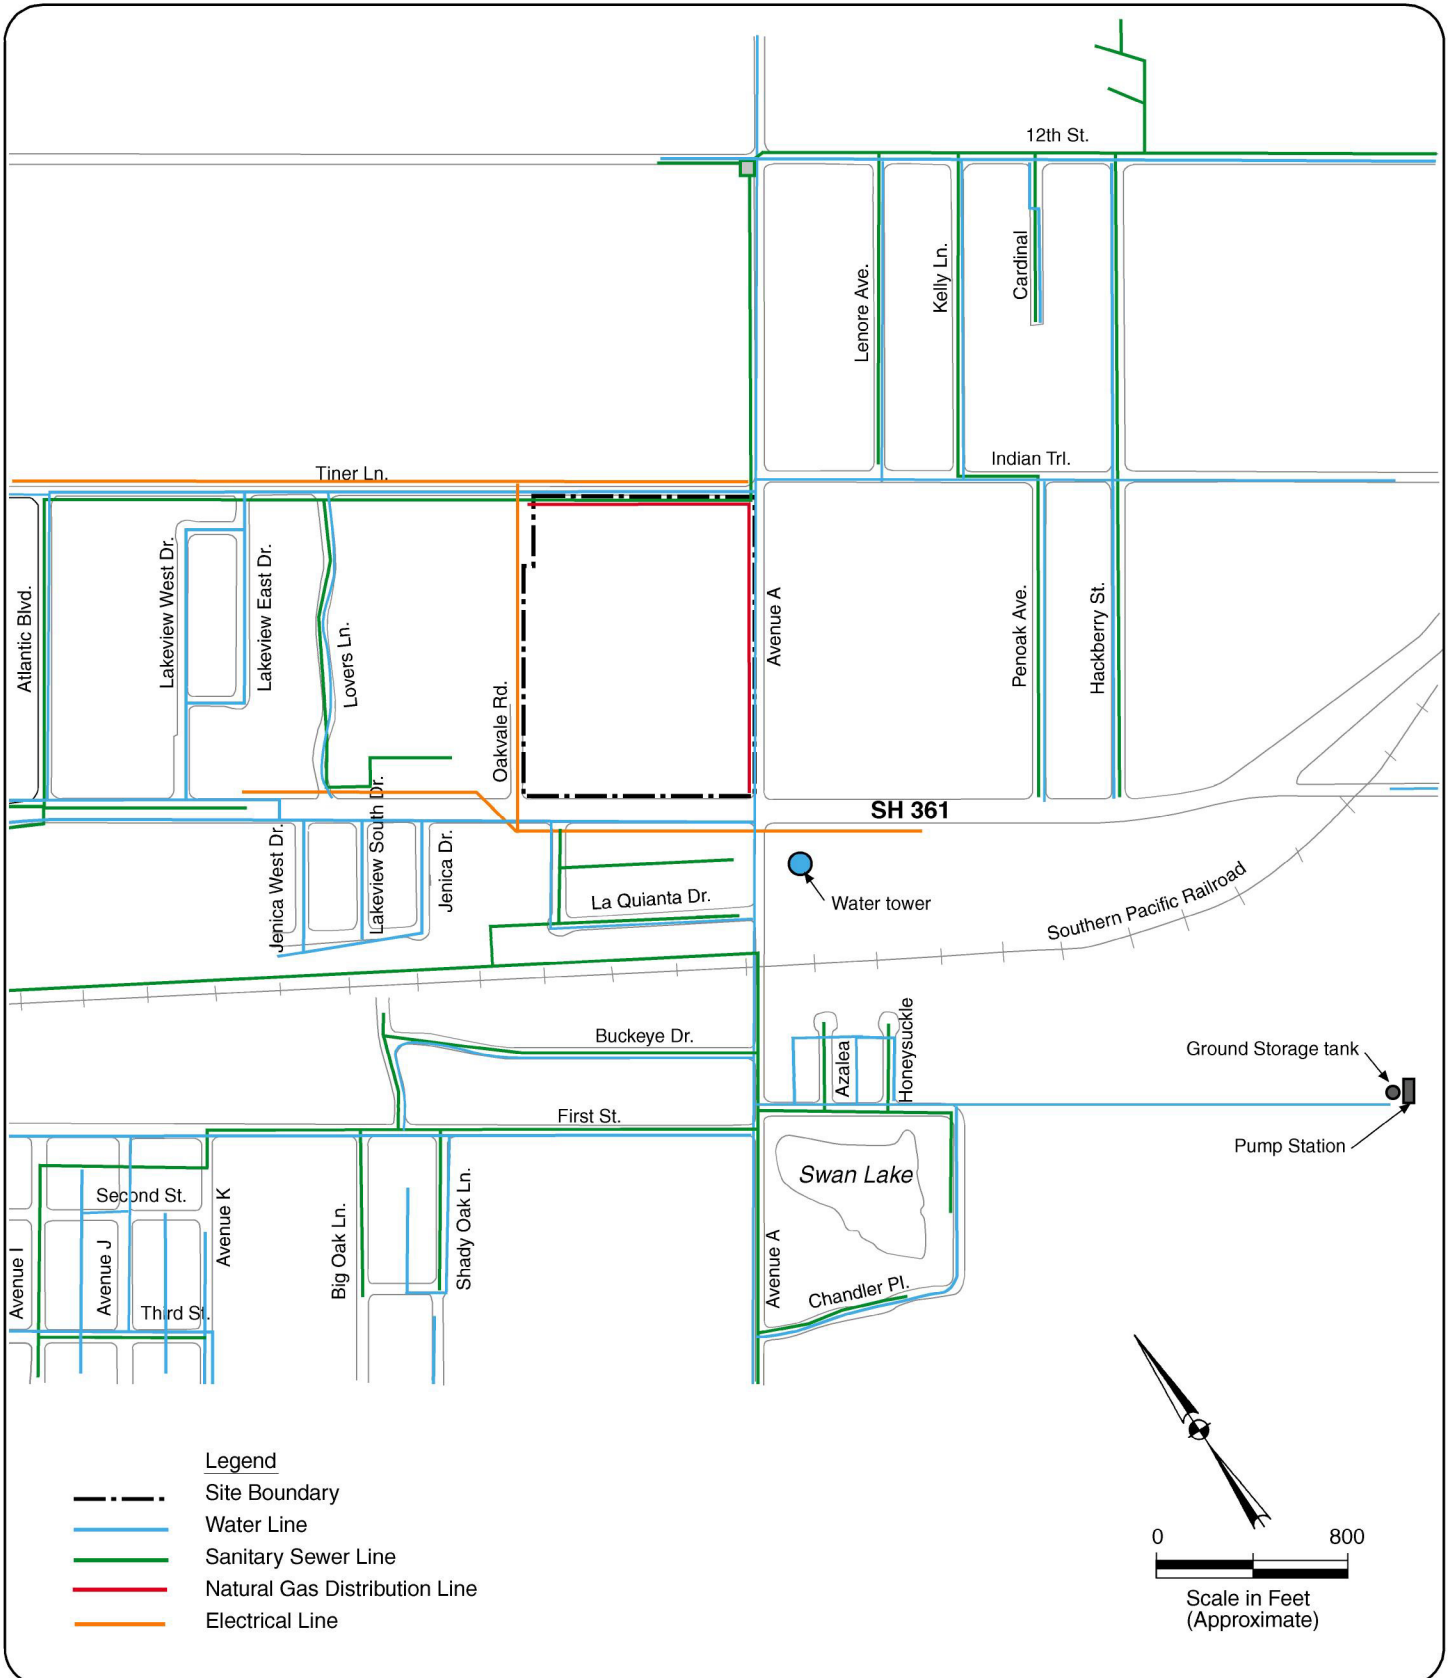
Existing Utilities - Alternative Site C, Ingleside
